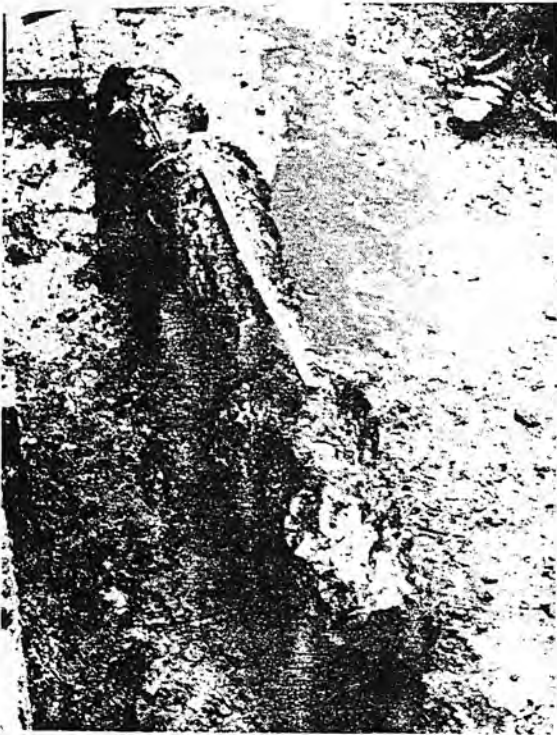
Section of multi-underreamed fixed anchor excavated from London clay at Vauxhall Bridge
